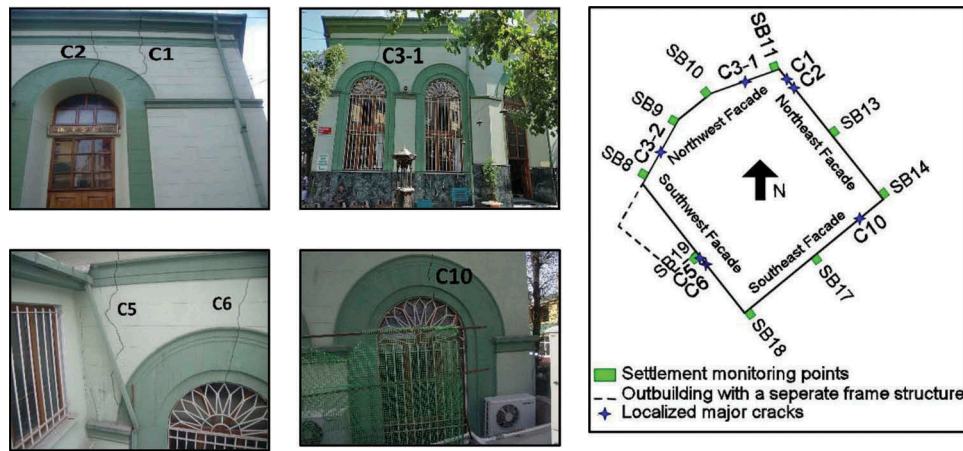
The pre-existing localized cracks and their locations in the plan of the mosque.
